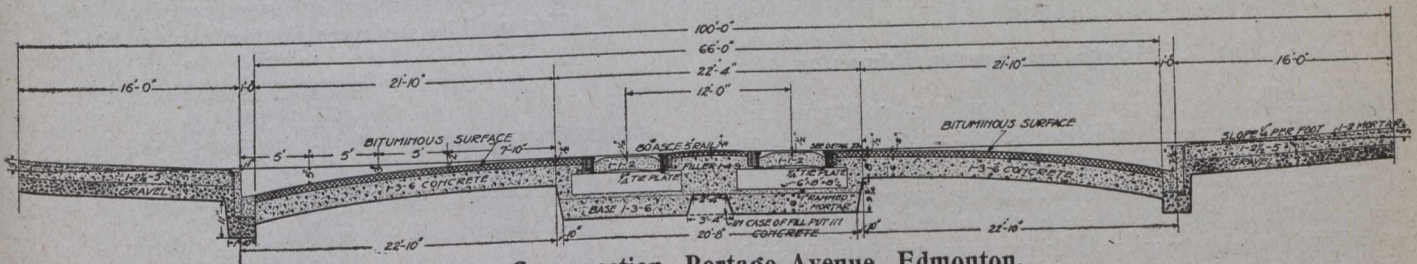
Cross-section, Portage Avenue, Edmonton.
